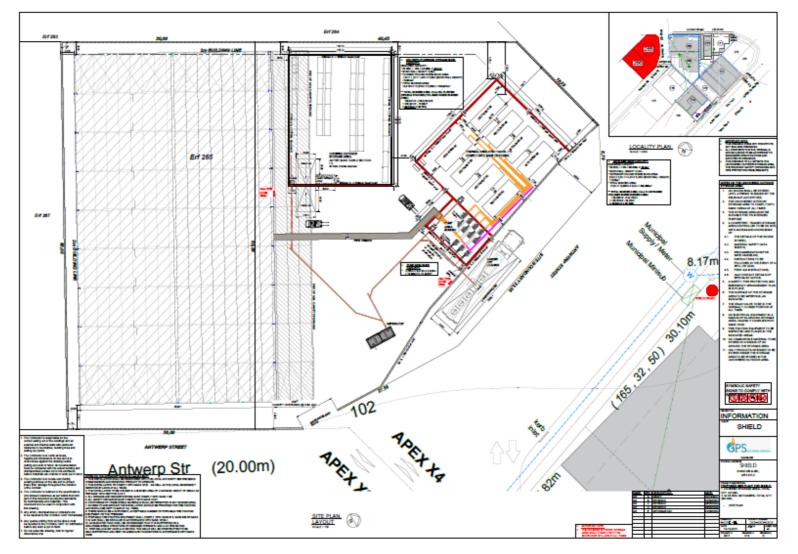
Site Development Plan (SDP) and location of tanks (GPS, 2023)
